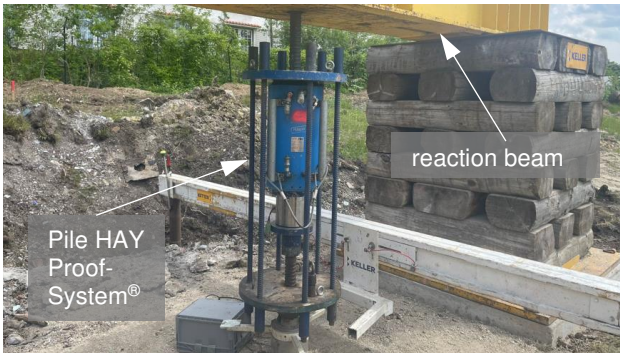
Entire testing set-up for bi-directional loading of instrumented Ductile Pile, with Pile HAY Proof-System® and horizontal reaction beam used for subsequent SPLT.
